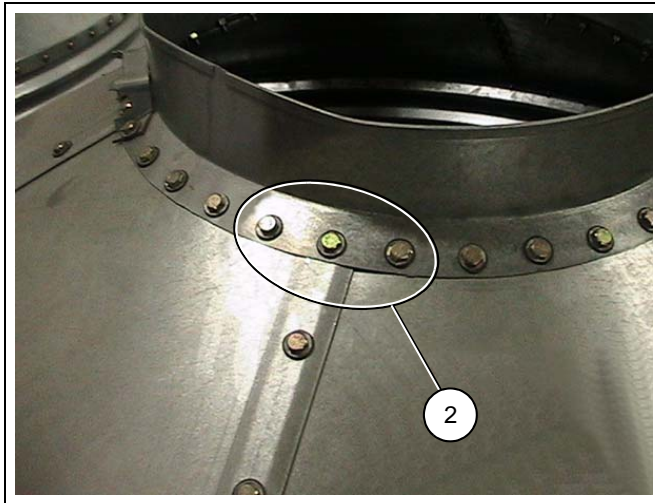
B Anchor Point Location Centered over Roof Panel Seam
